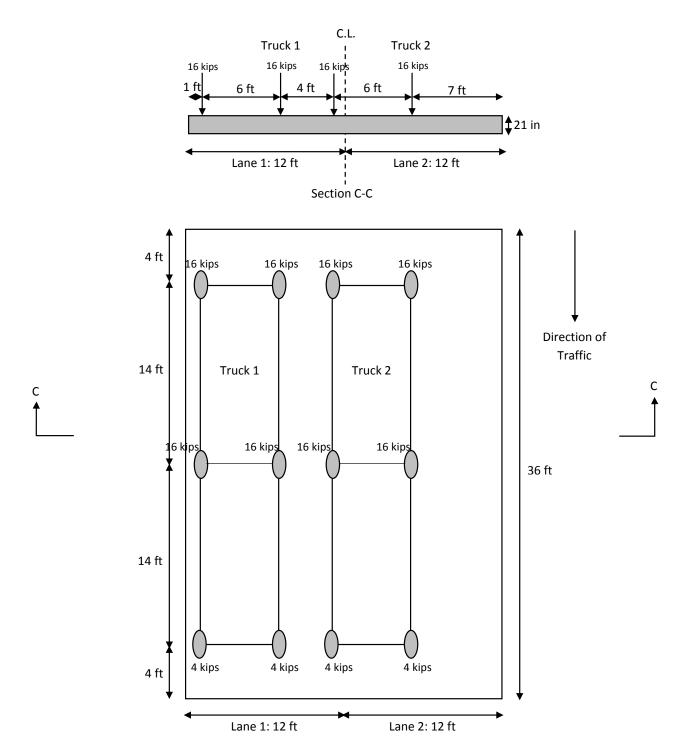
Typical Cross-Section and Plan of Two-Lane 36 ft Span Bridge under Edge Loading Condition with no railings
